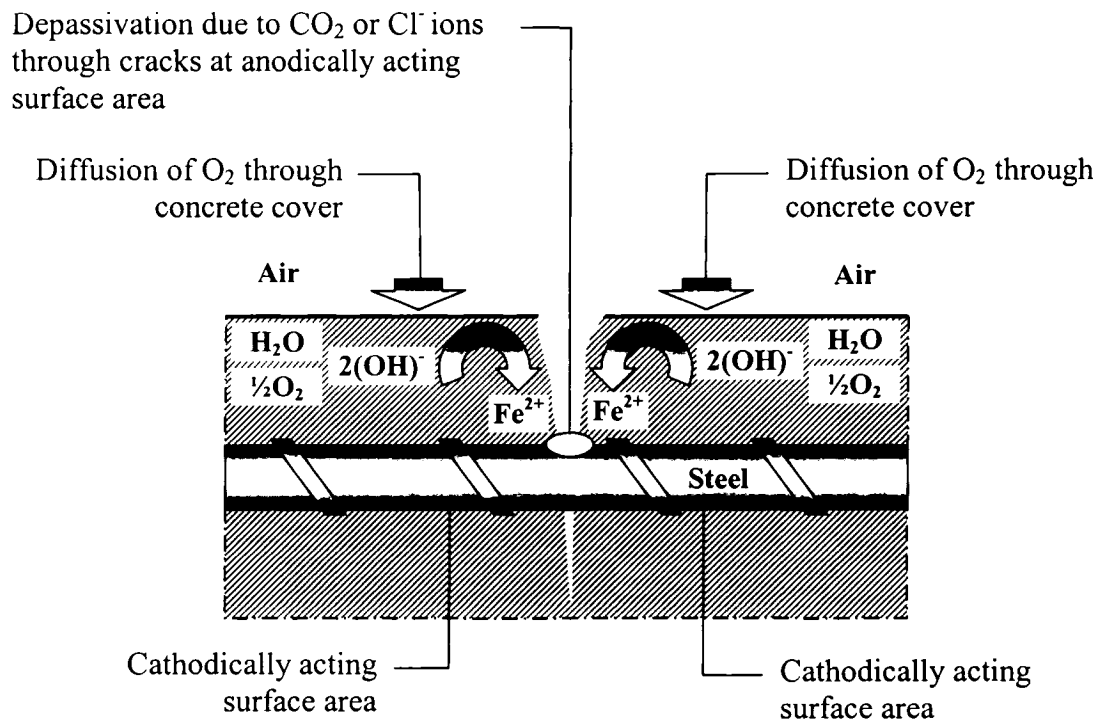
Corrosion of Reinforcement in concrete Cracks
